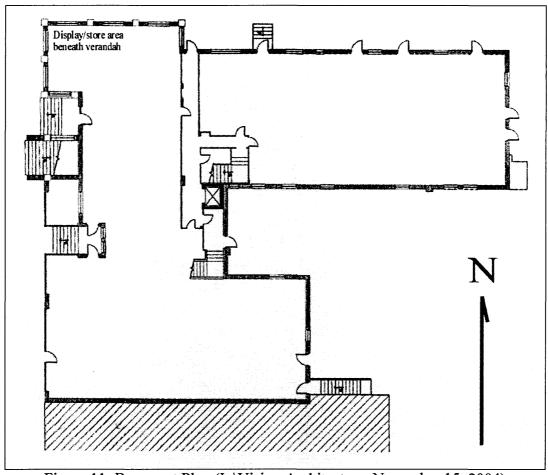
Basement Plan (In\Vision Architecture, November 15, 2004)
